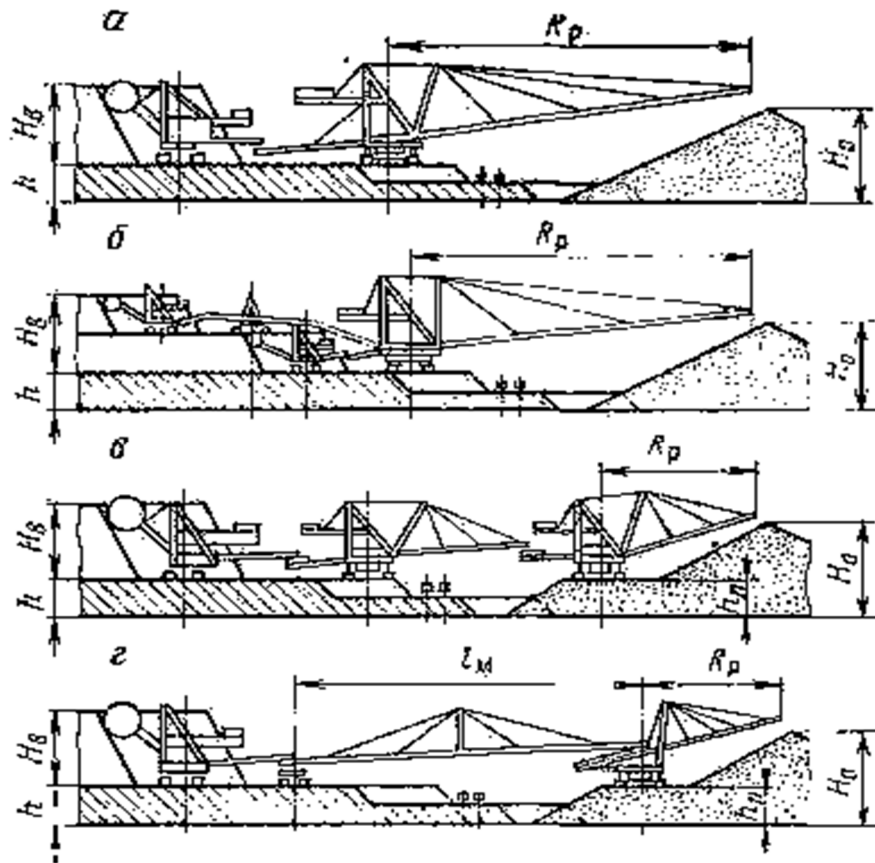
Excavation schemes when using cantilever dumpers.
